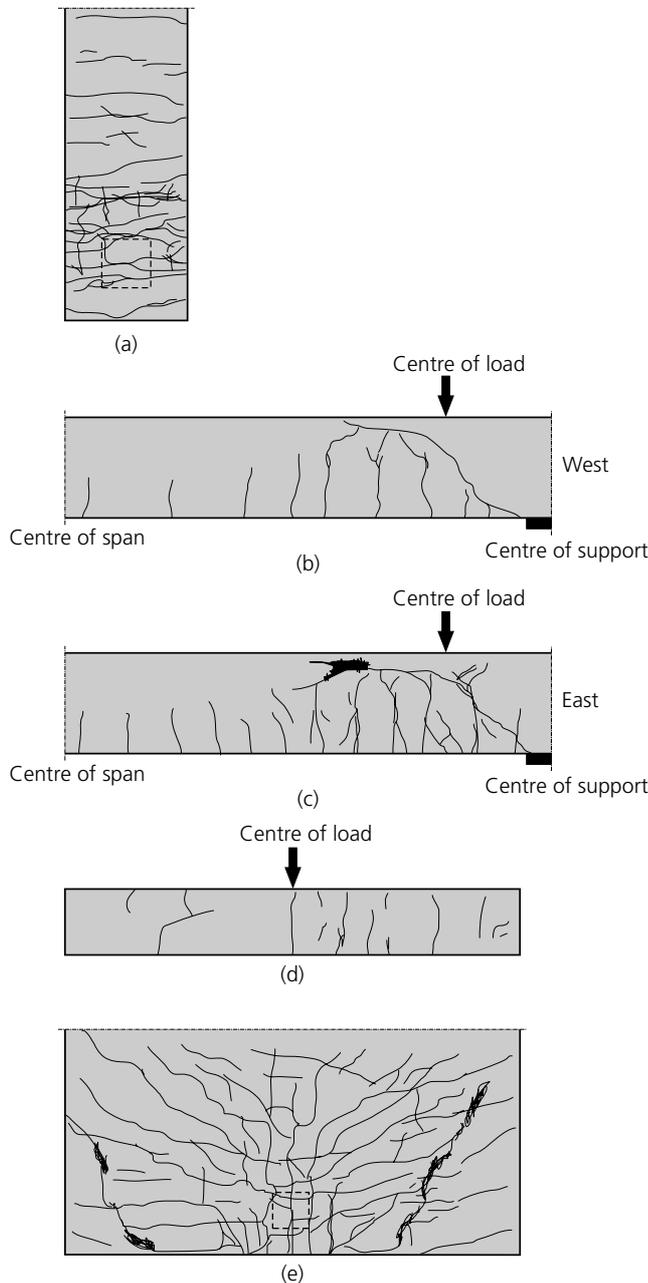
One-way shear: cracks after failure of BS2T1 (Lantsoght *et al.*, 2014): (a) bottom face; (b) west side face; (c) east side face. Two-way shear: cracks after failure of S9T1 (Lantsoght *et al.*, 2013c): (d) front face; (e) bottom face
